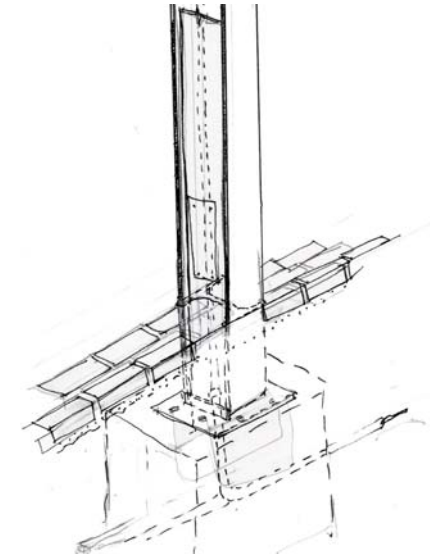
Inspection hole and conduit channeled behind 2mm steel flange welded to inside of H-Section. Scale: Not to scale (Author, 2008)
